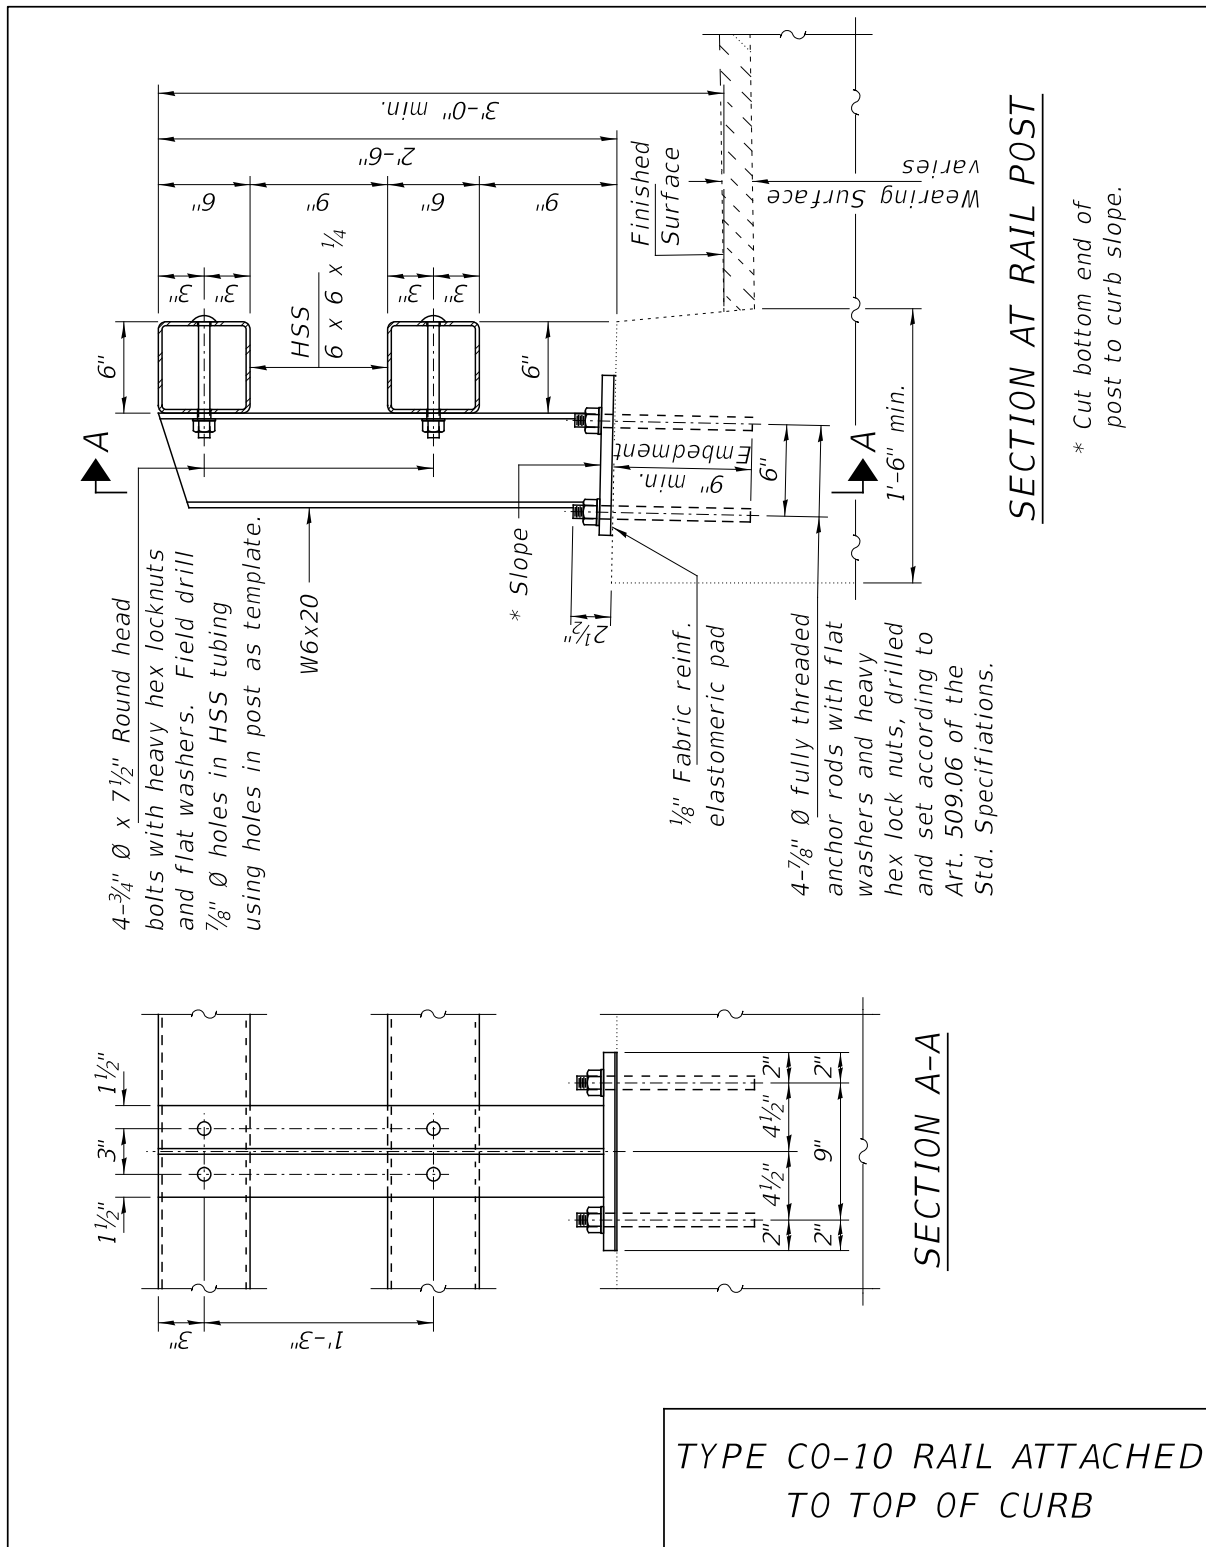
Type CO-10 Rail Attached to Top of Curb
